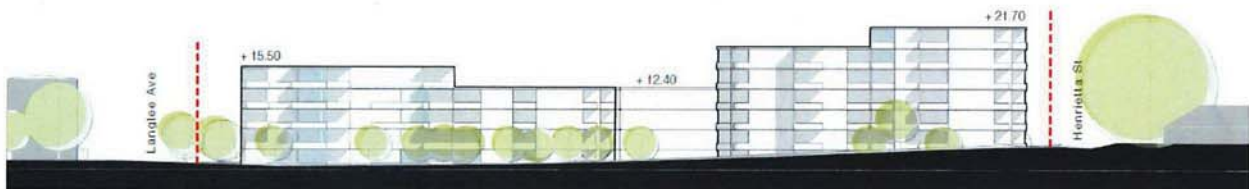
Birrell Street elevation (Source: Hamptons Property Services)
